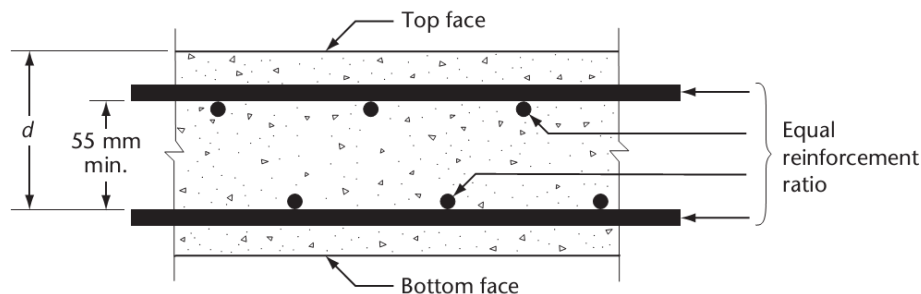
Reinforcement details of cast-in-place deck slab ([Clause 8.18.4.2](#))
